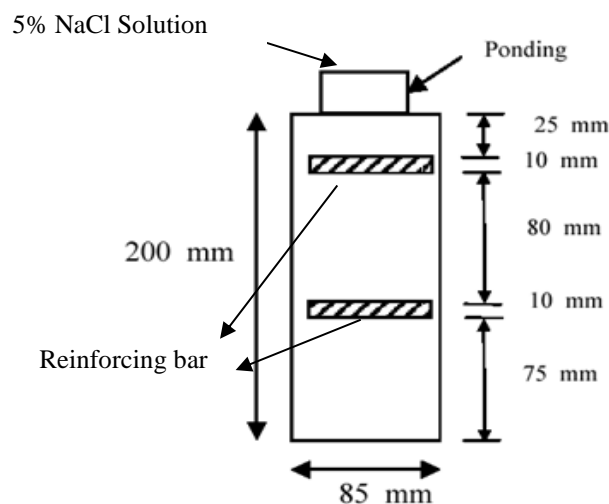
Schematic of ponding test setup for reinforced concrete specimens
